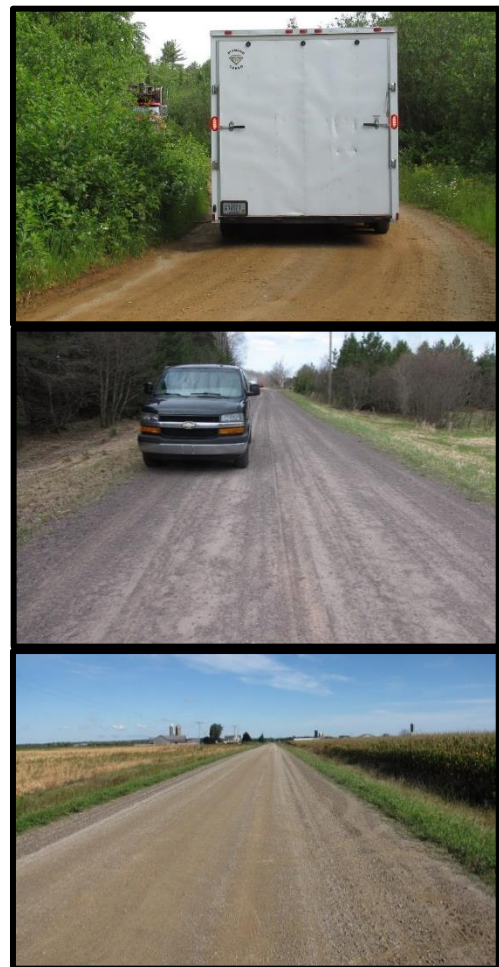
Top*– Road with IBR number of 1 road that has poor surface width, poor drainage adequacy, and poor structural adequacy. *Middle*– Road IBR number of 7 that has fair surface width, fair drainage adequacy, and fair structural adequacy. *Bottom*– Road with IBR number of 9 road that has good surface width, good drainage adequacy, and good structural adequacy.
